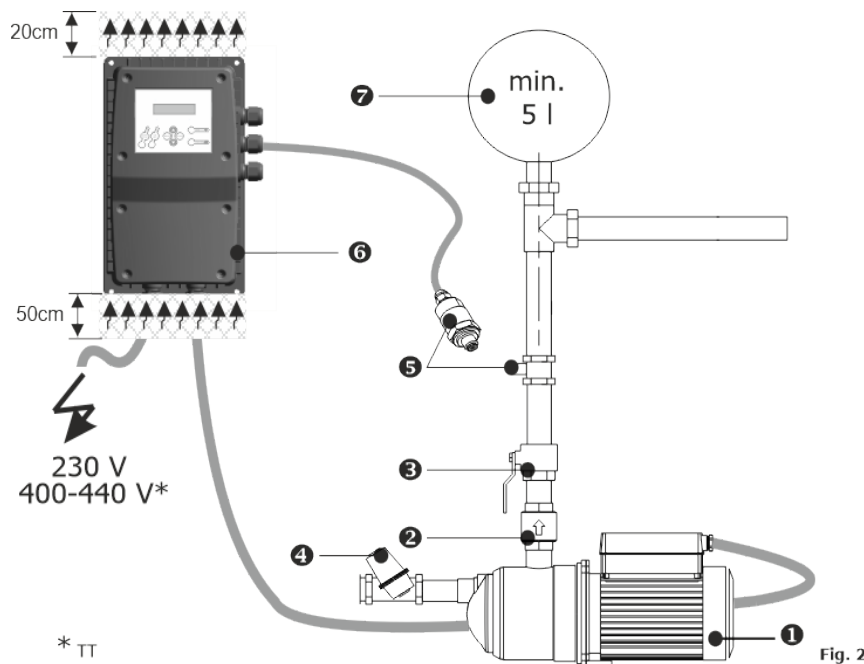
INSTALLATION SCHEME - INSTALLATIONSSCHEMA - INSTALLATIESCHERM - SCHEMAT INSTALACJI
